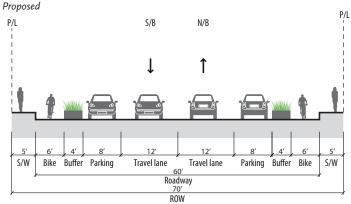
Typical Cross-Section for Cambridge Avenue, Arrow Hwy to Bonita Av.
